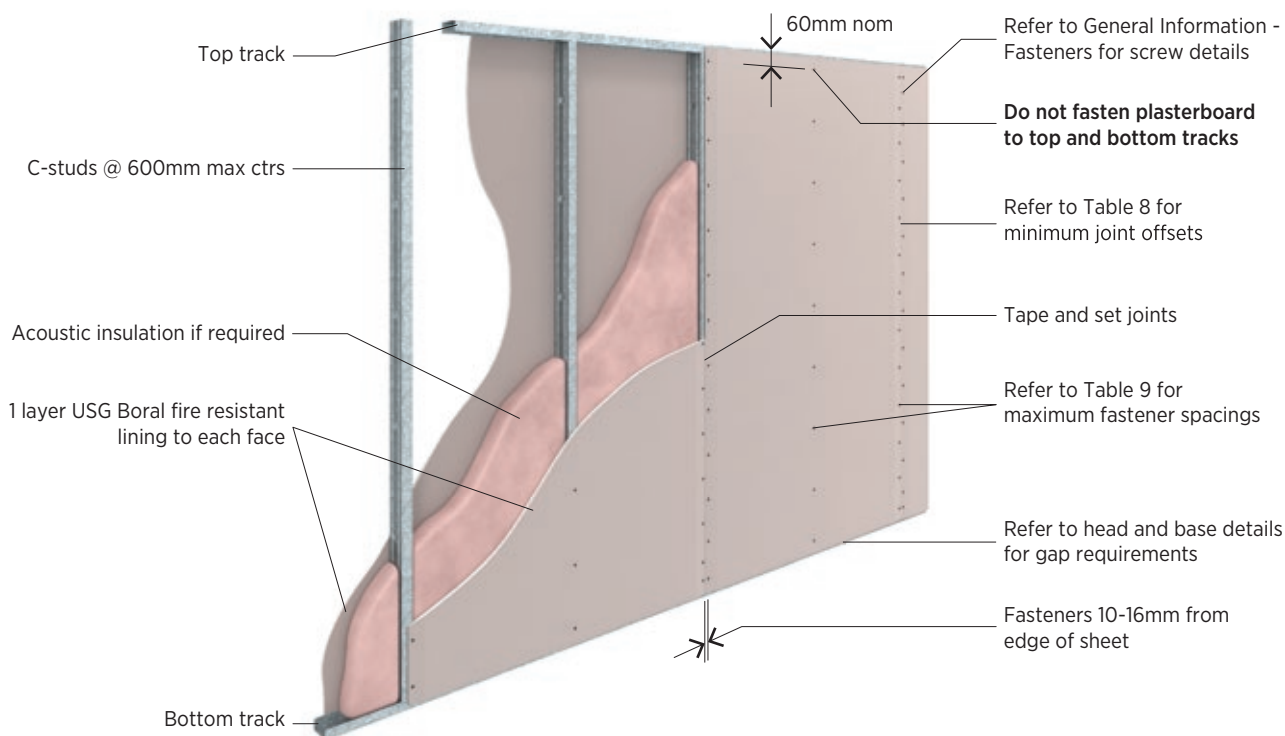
Fire-rated Steel Stud – Vertical Fixing – Single Layer
